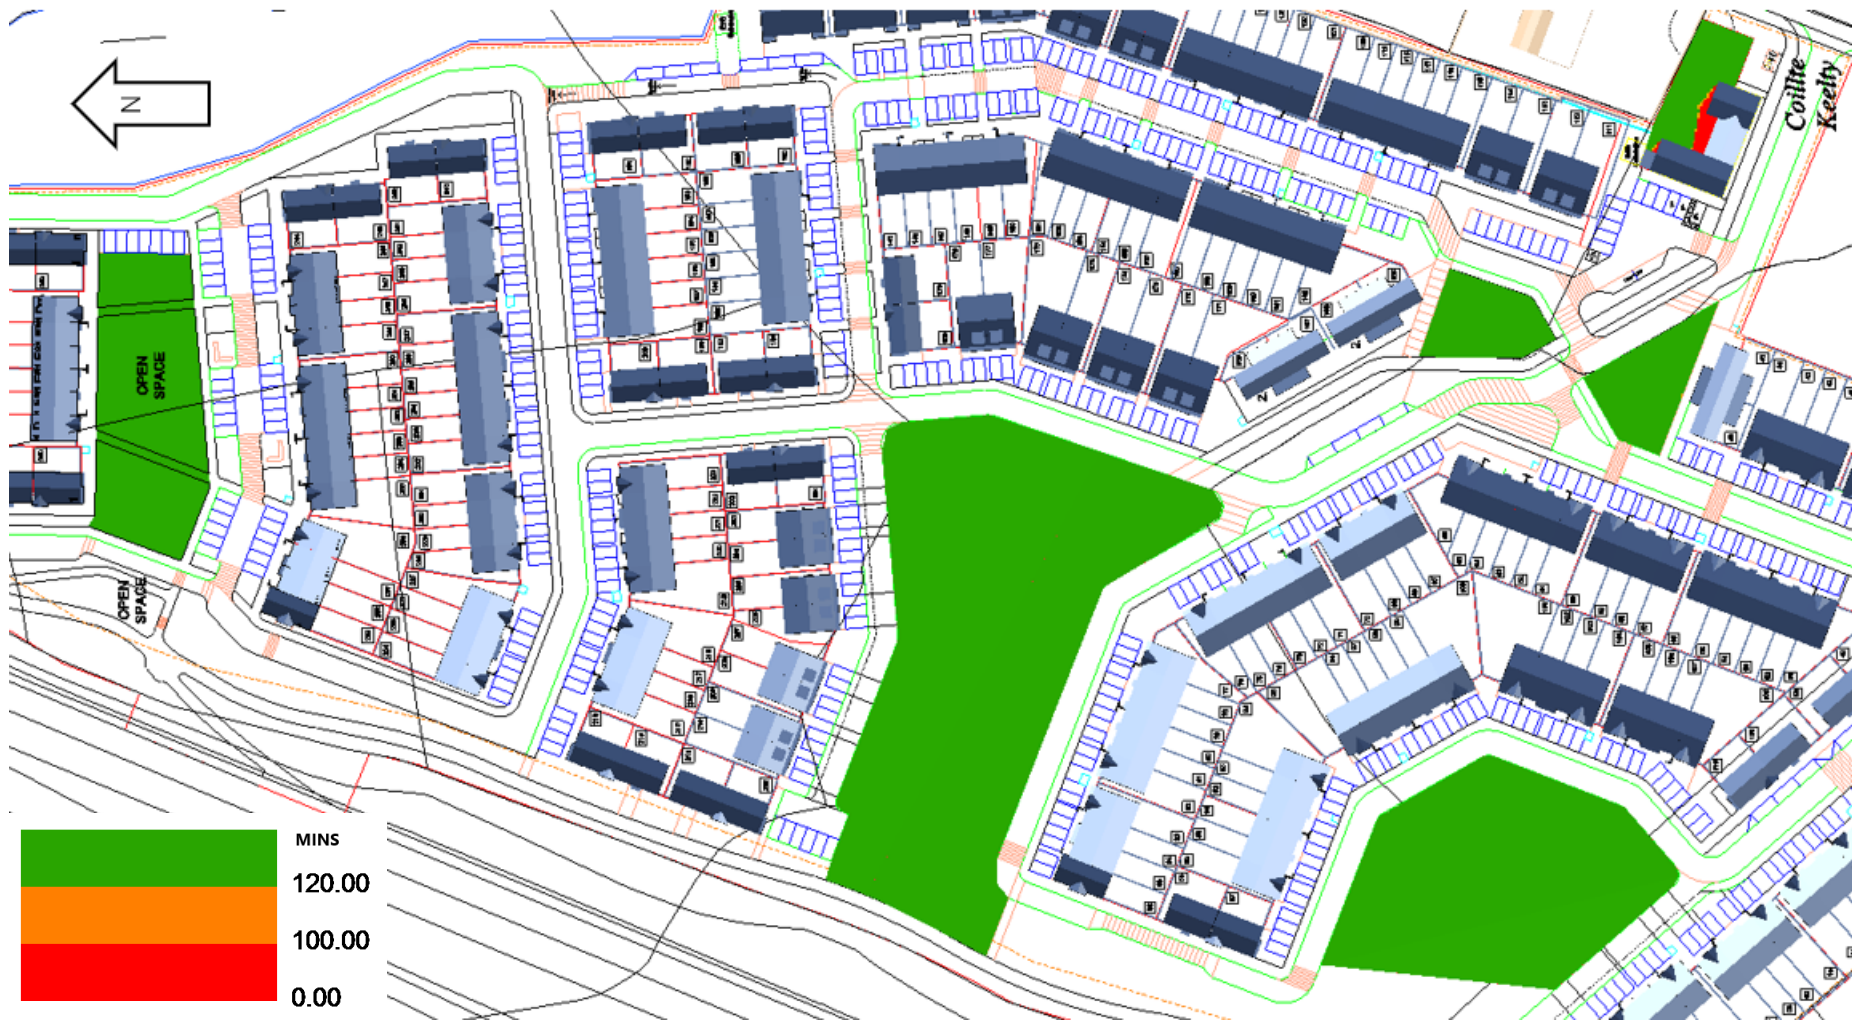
Proposed Open Spaces 2hr Sunlight Test
